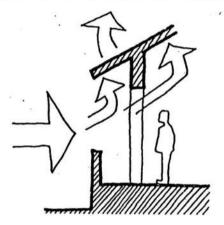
Problem with this design in abnormal high wind conditions. (In extreme conditions the wind forces will enter the house, breaking glass and collecting below the veranda eaves thus pulling the roof off. This is encouraged by negative wind pressure on the roof.)
